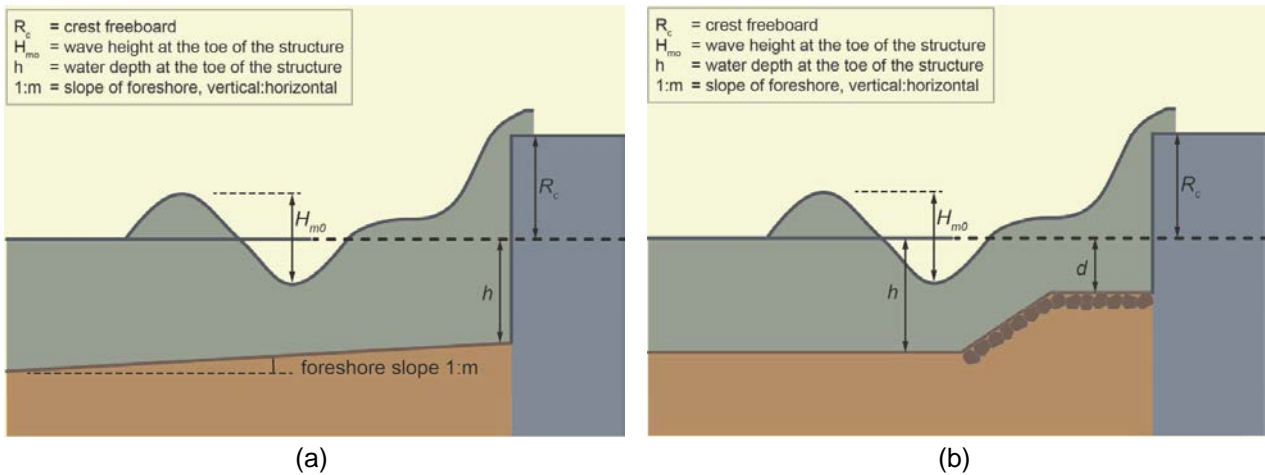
Principle cross-section for (a) plain and (b) composite vertical walls. Source: Figure 7.6 and Figure 7.14 in EurOtop (2016)
